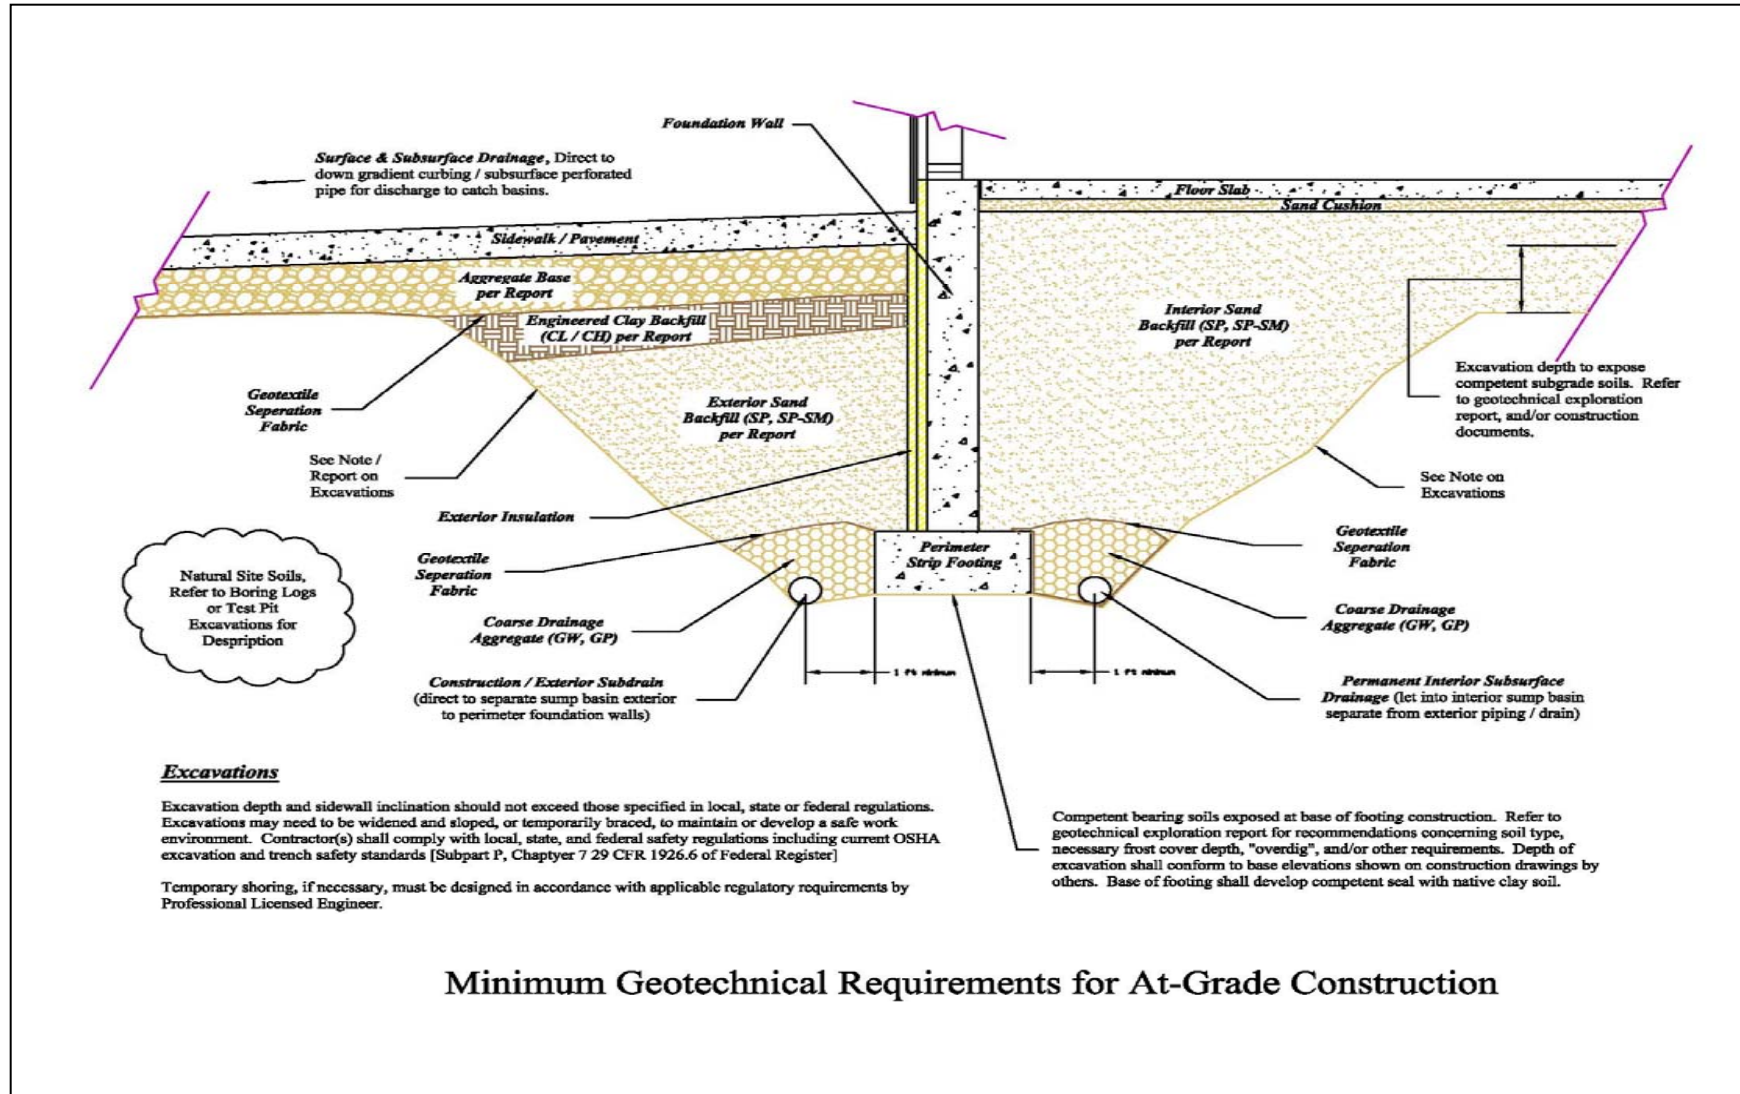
Minimum Geotechnical Requirements for At-Grade Construction
